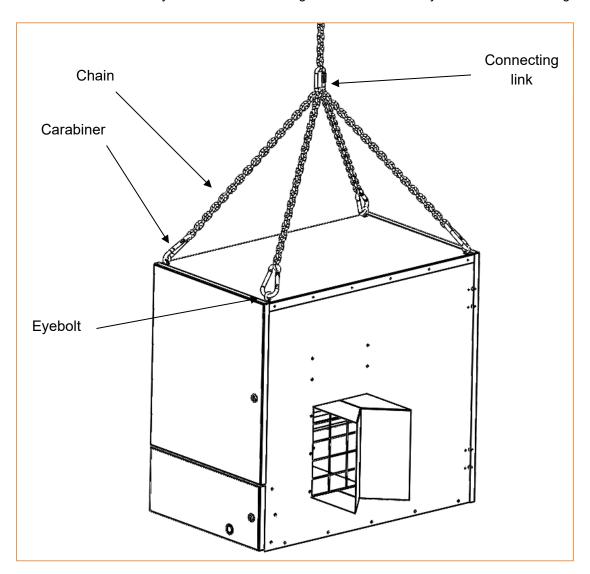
Heater mounted with chain setup - four chains to connecting link
